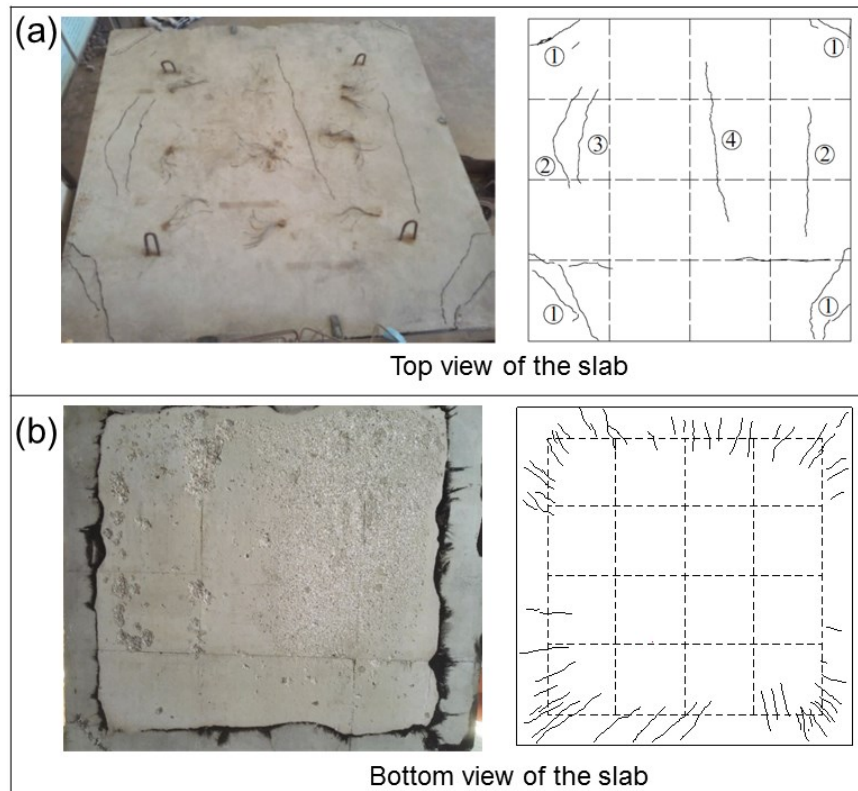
(a) Top view of slab and (b) bottom view of slab after the fire test reproduced from Wang et al. (2016)
